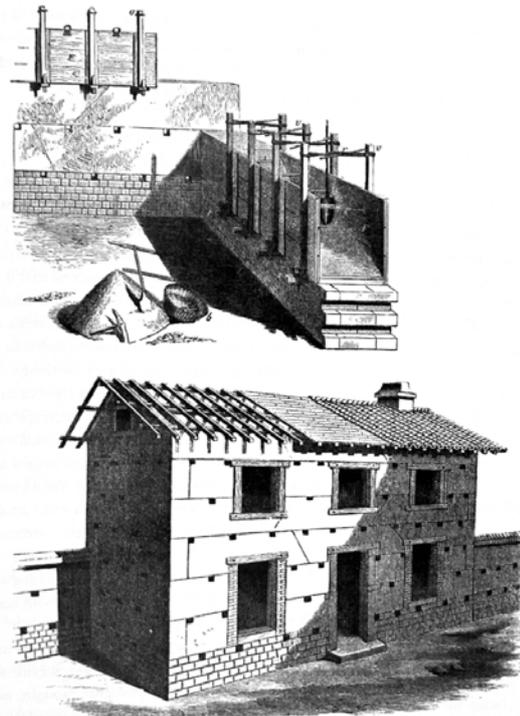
Illustration of traditional *pisé* construction adapted by F. Coignet to build a massive concrete house, 1852. (Peters¹)
